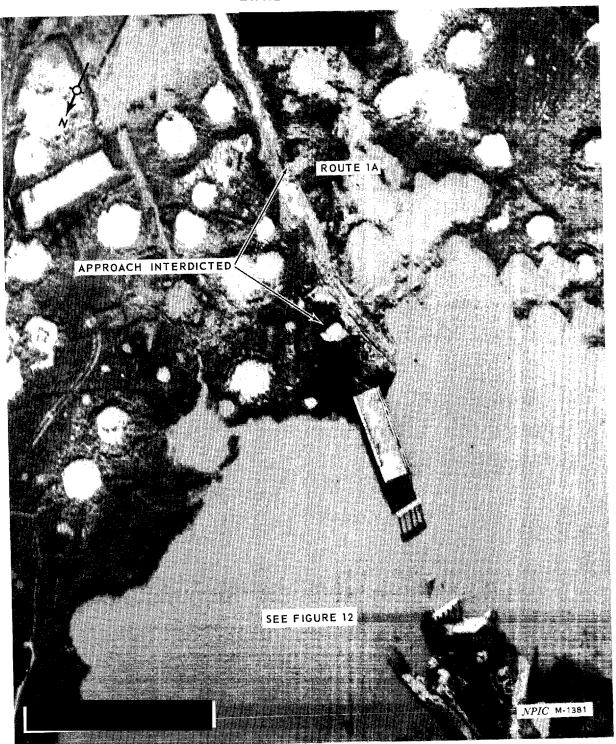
CONSTRUCTION ABANDONED, BRIDGE STRUCK, SONG GIA HOI, CAM XUYEN AREA, NORTH VIETNAM
